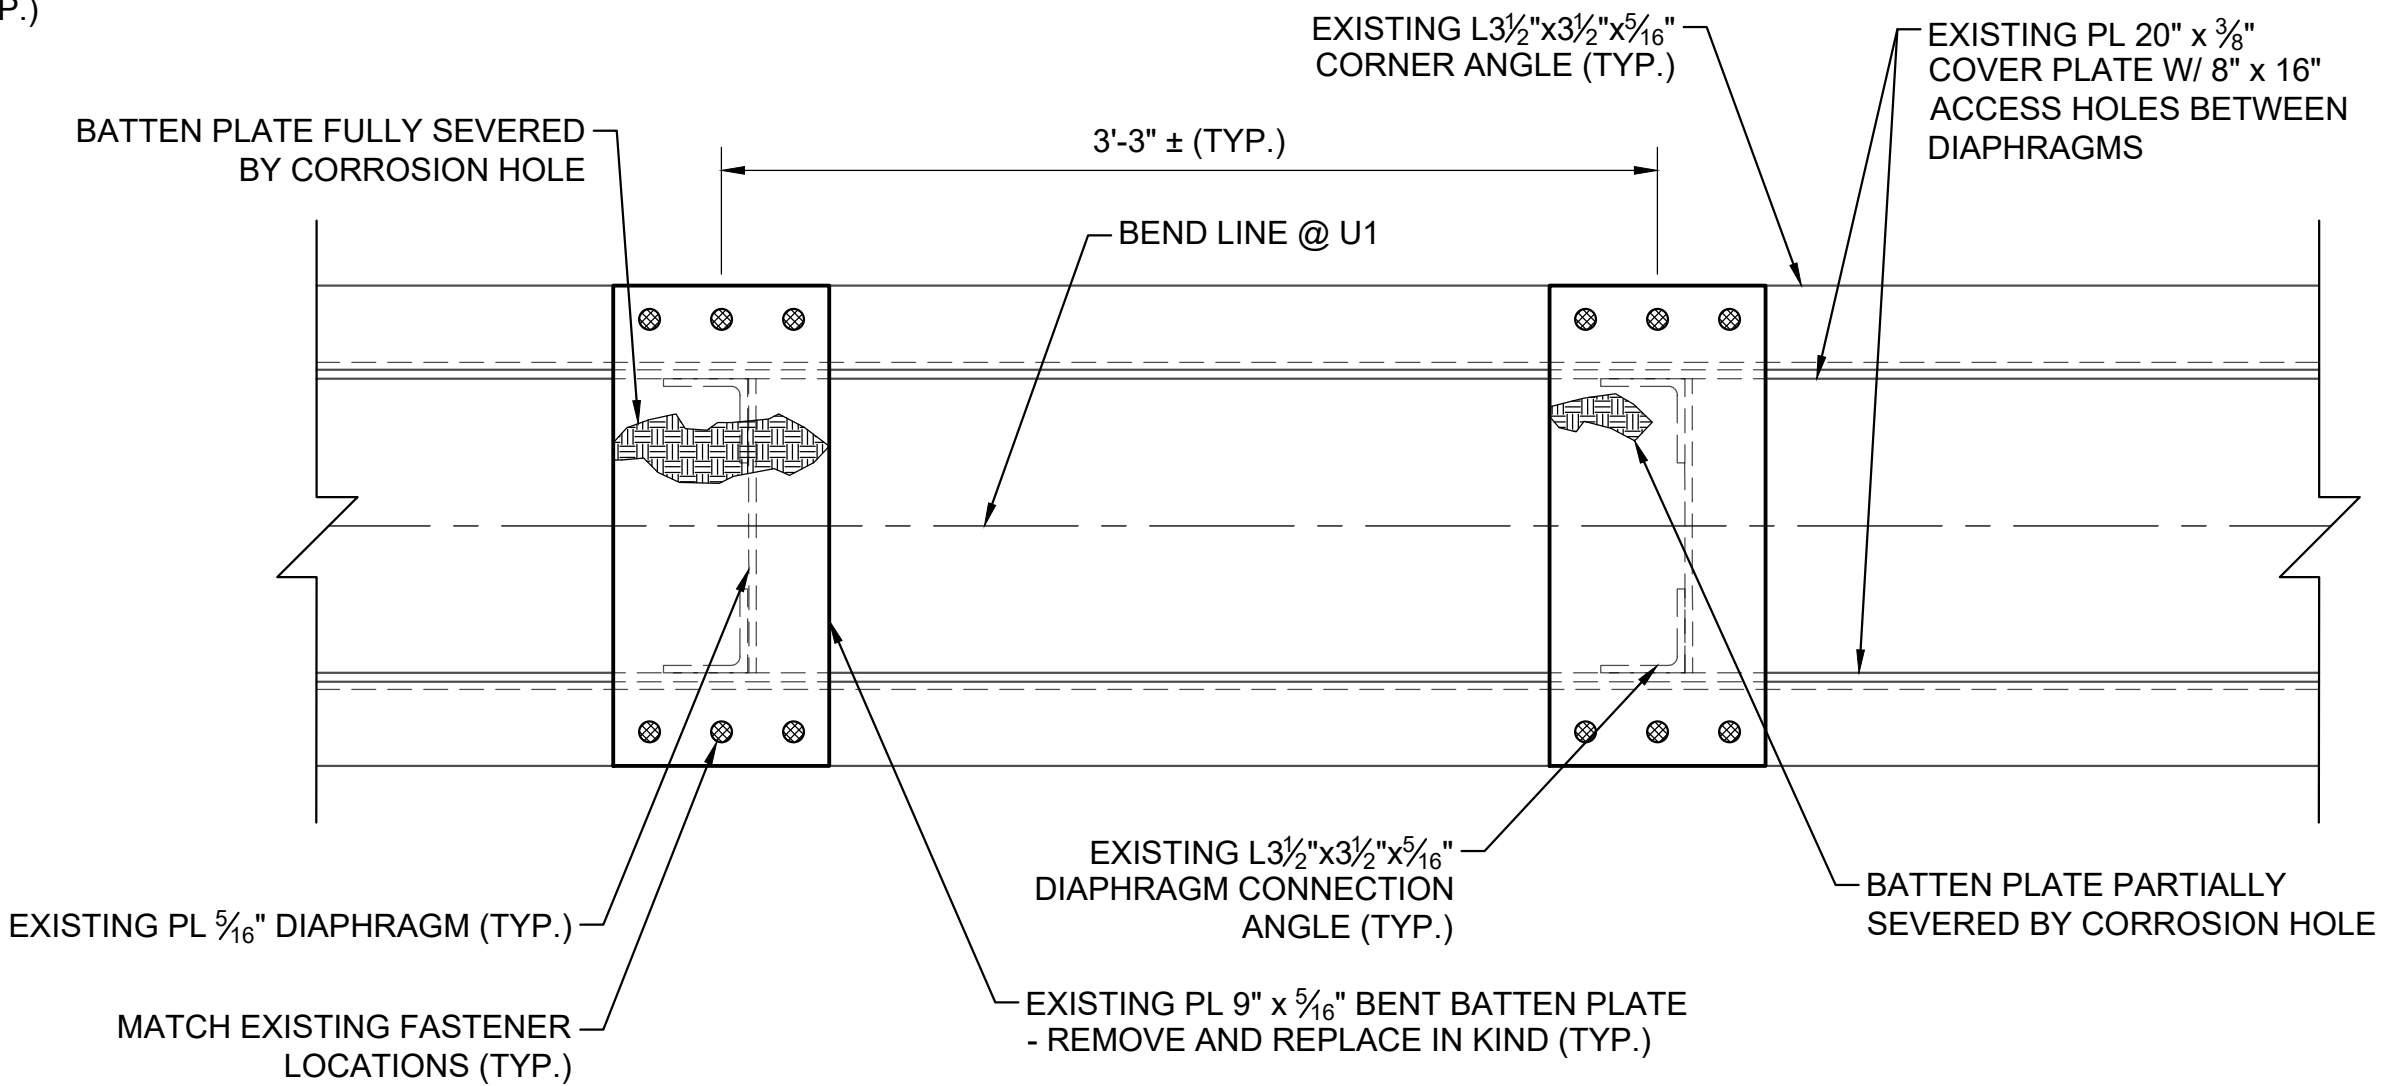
### DETAIL-SPECIFIC NOTES (NCB-NB TRUSS PORTAL REPAIR TYPE 1)
